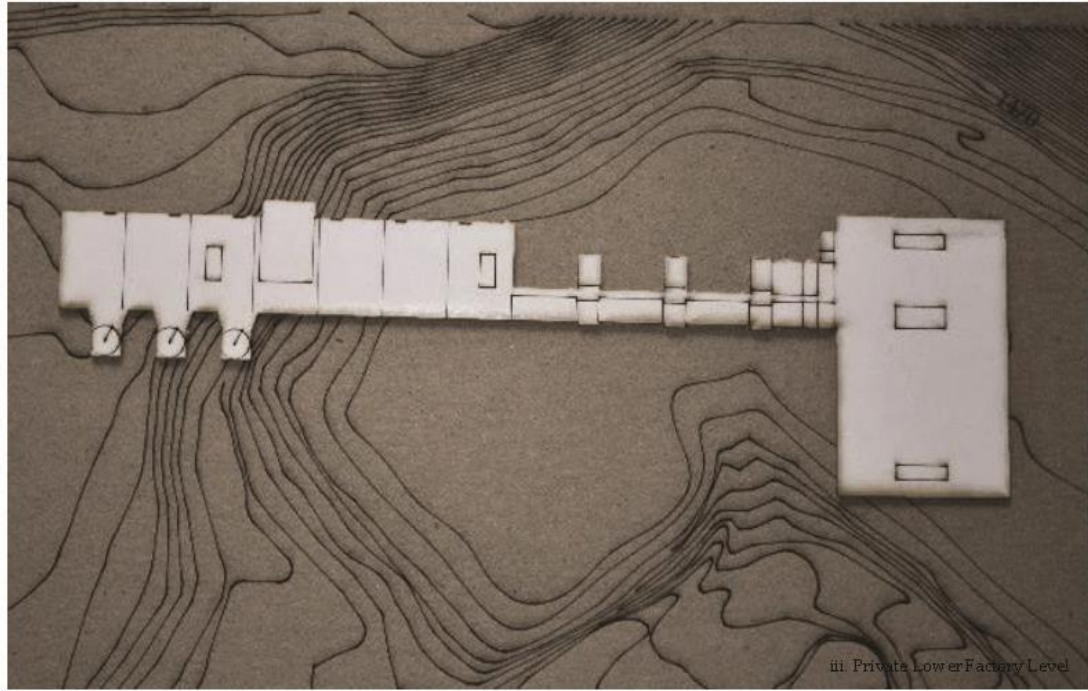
Diagrams of the various floor plan layouts of the finalised design (Author, 2013)
